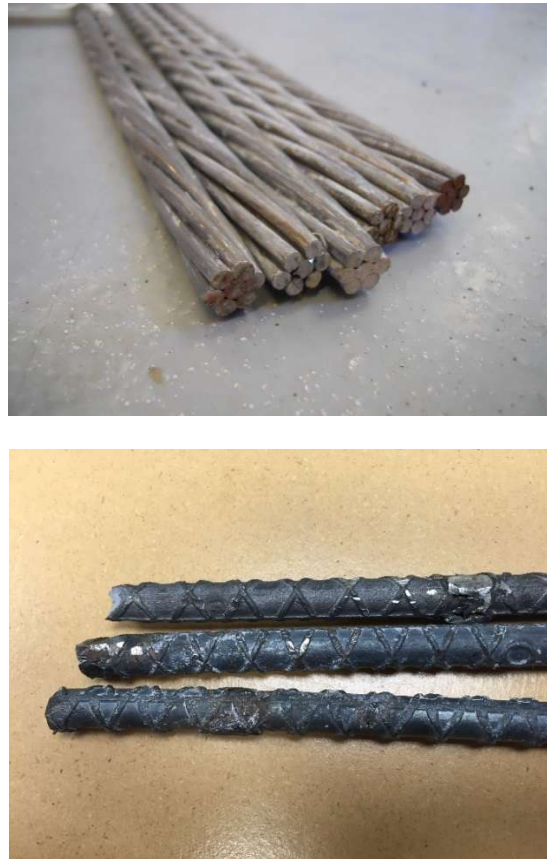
Condition of prestressing strands and reinforcing steel after structural testing.
